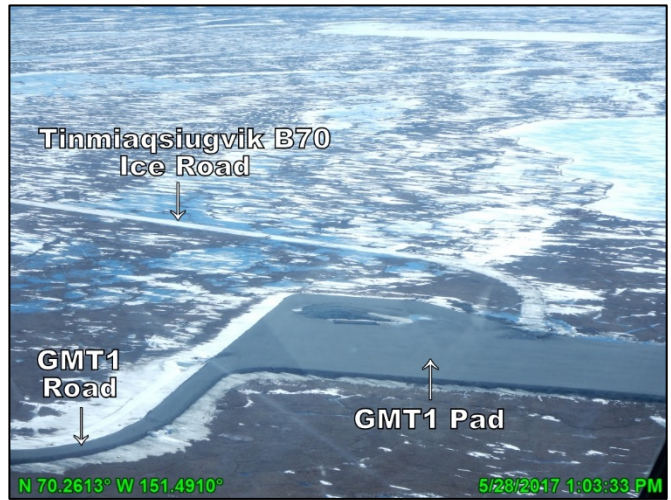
Local melt at GMT1 pad, looking south; May 28, 2017
